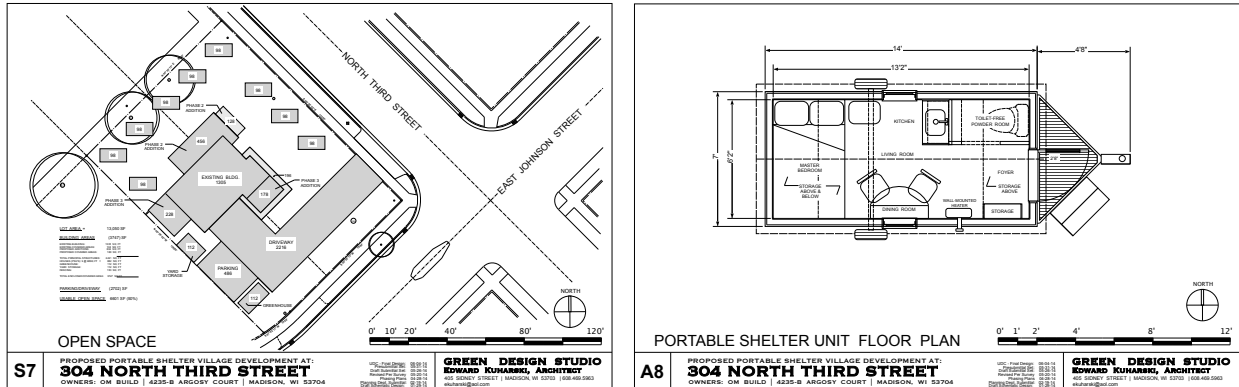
OM Village Site Plan (Left) and Floor Plan (Right).
